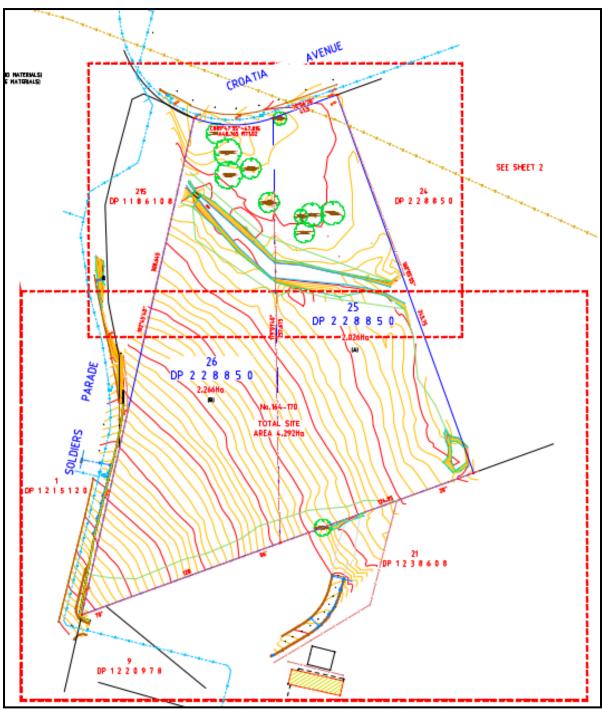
Site Survey Plan (Source: StrataSurv, Draw No. 4418DT01a2, Rev. A dated 5/05/2020)
